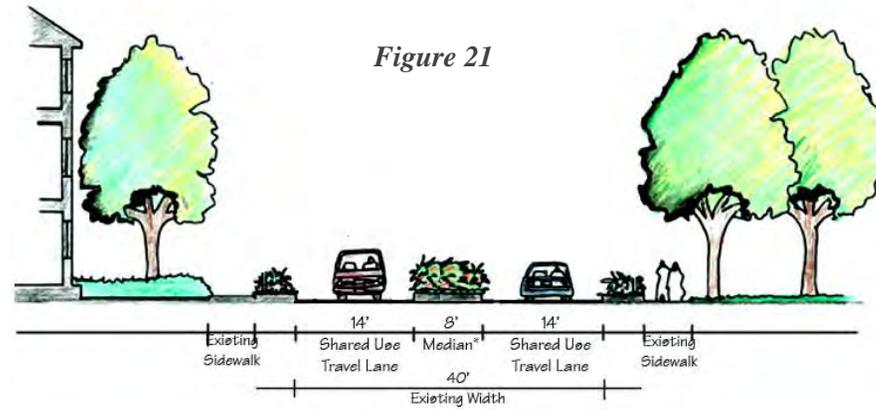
and 22 show existing and proposed typical sections of Naylor Road between Good Hope Road and Altamont Place and between Altamont Place and T Street. The section between Good Hope Road and Altamont Place includes a 14 foot shared use travel lane in each direction and an 8 foot parking lane on one side.
